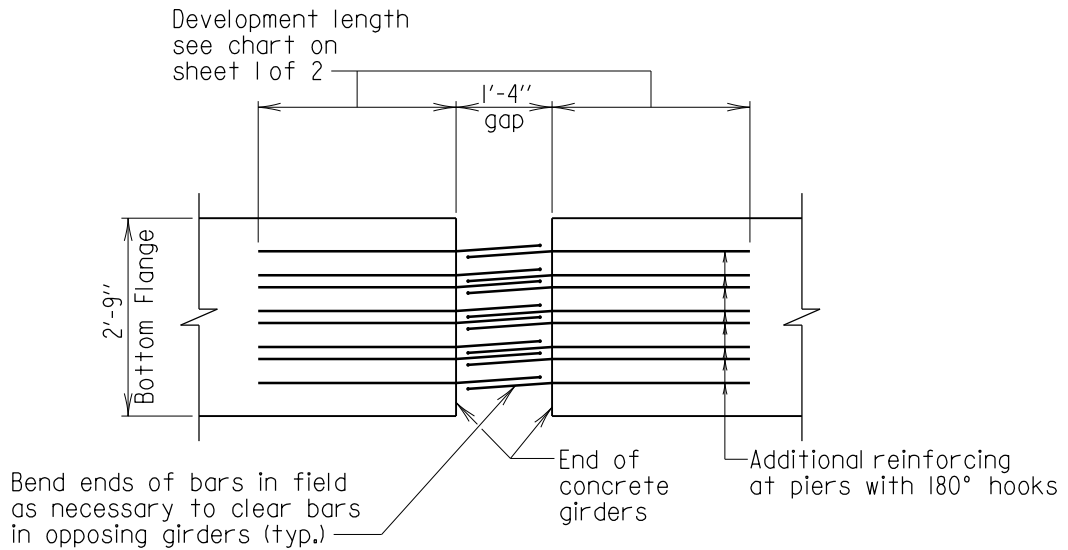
DETAIL NO. SUP-CG(GEN)-601 SHEET 1 OF 2
